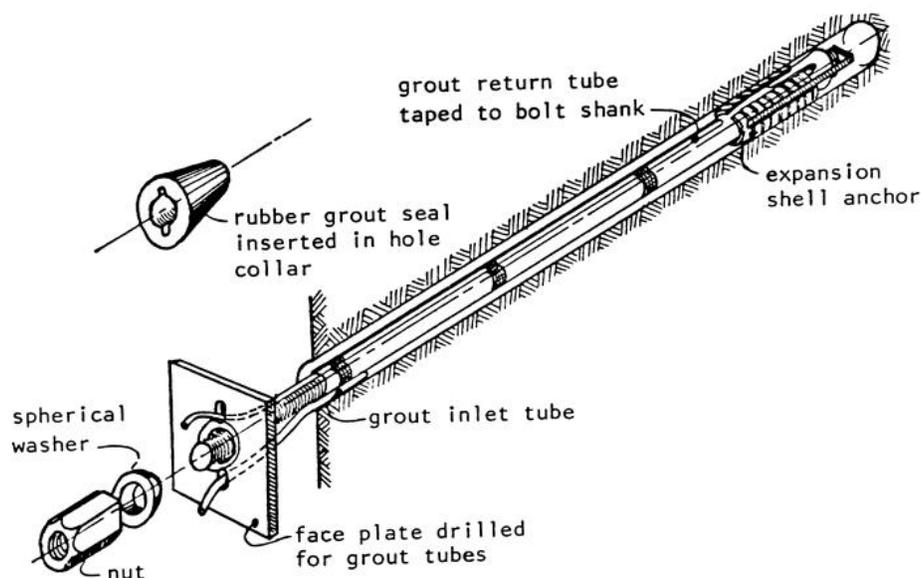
Mechanically anchored, tensioned and grouted rockbolt system commonly used in civil engineering in hard rock tunnels.
